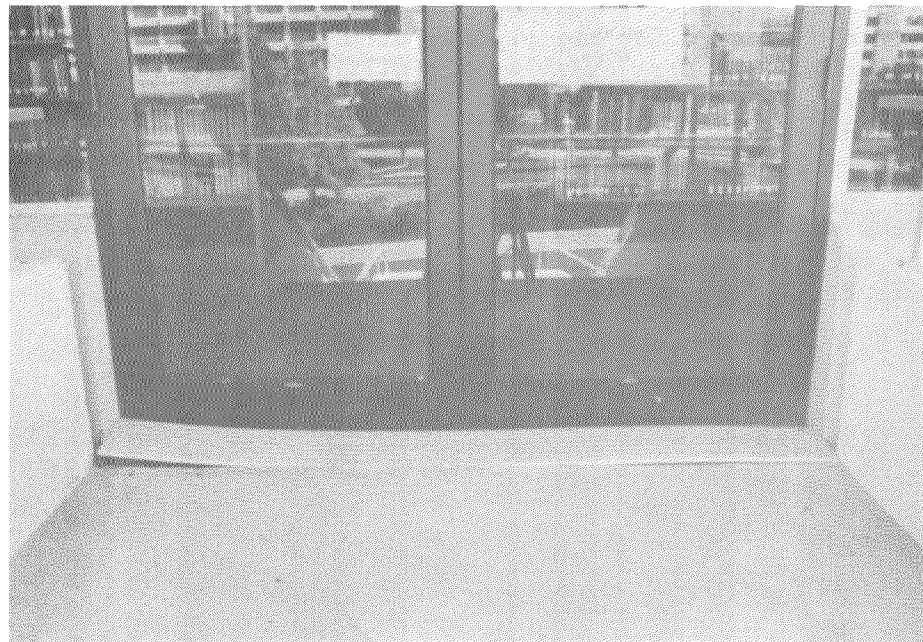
Close-up of damage to seismic joint between stairway and building in Fig. 11.7. Note that damaged cover plate blocks the opening of emergency doors.
